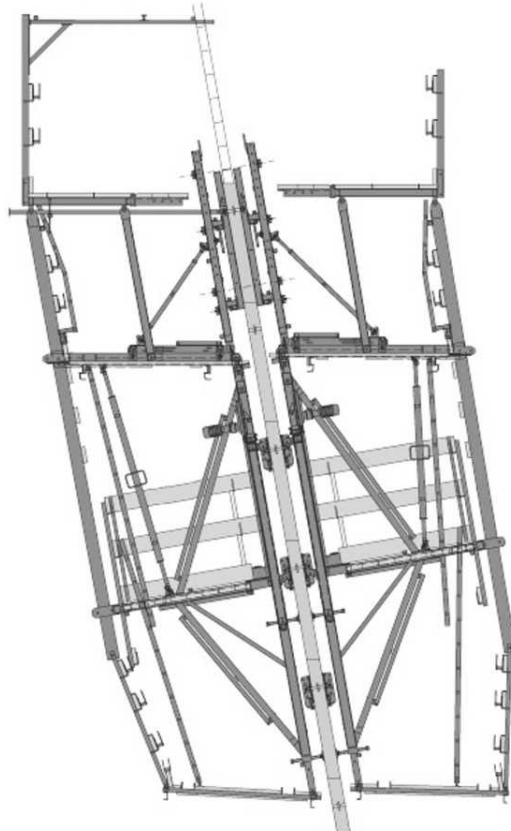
Cooling Tower Formwork SK 175 (Courtesy L&T Formwork).
